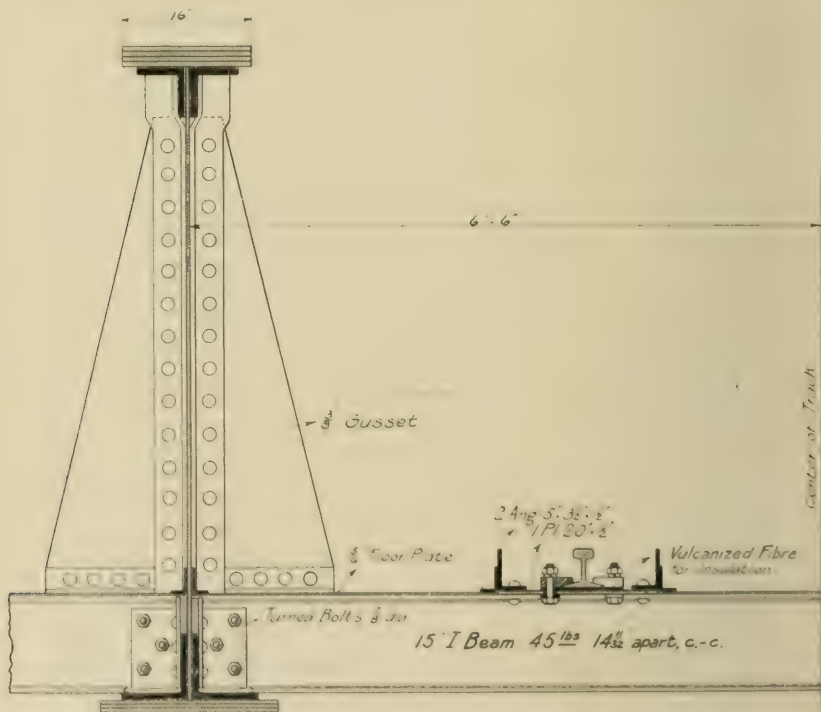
SECTION OF FLOOR FOR BRIDGES, C. B. & Q. R. R.
